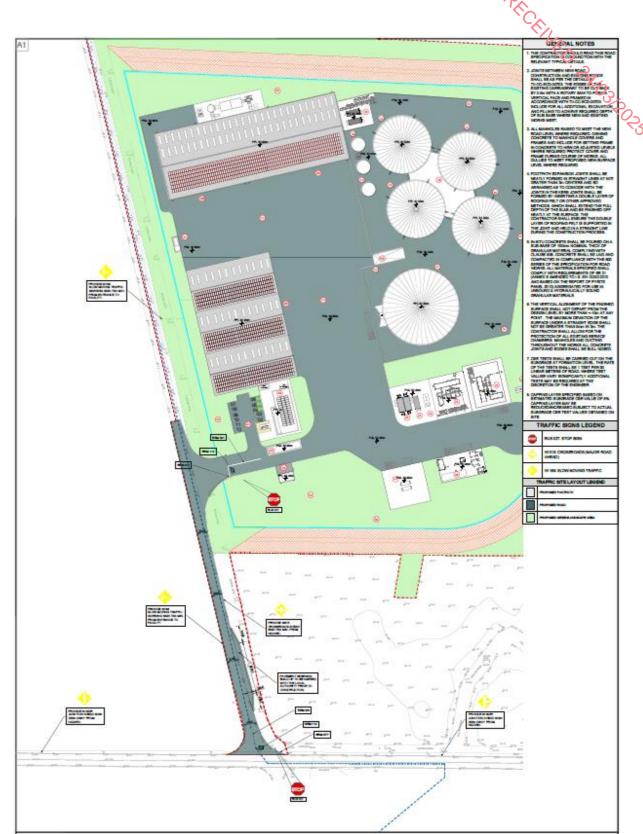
Proposed Site Layout Including Road Markings and Traffic Signs (ORS Ref: 231240-ORS-ZZ-00-DR-TII-1200)
